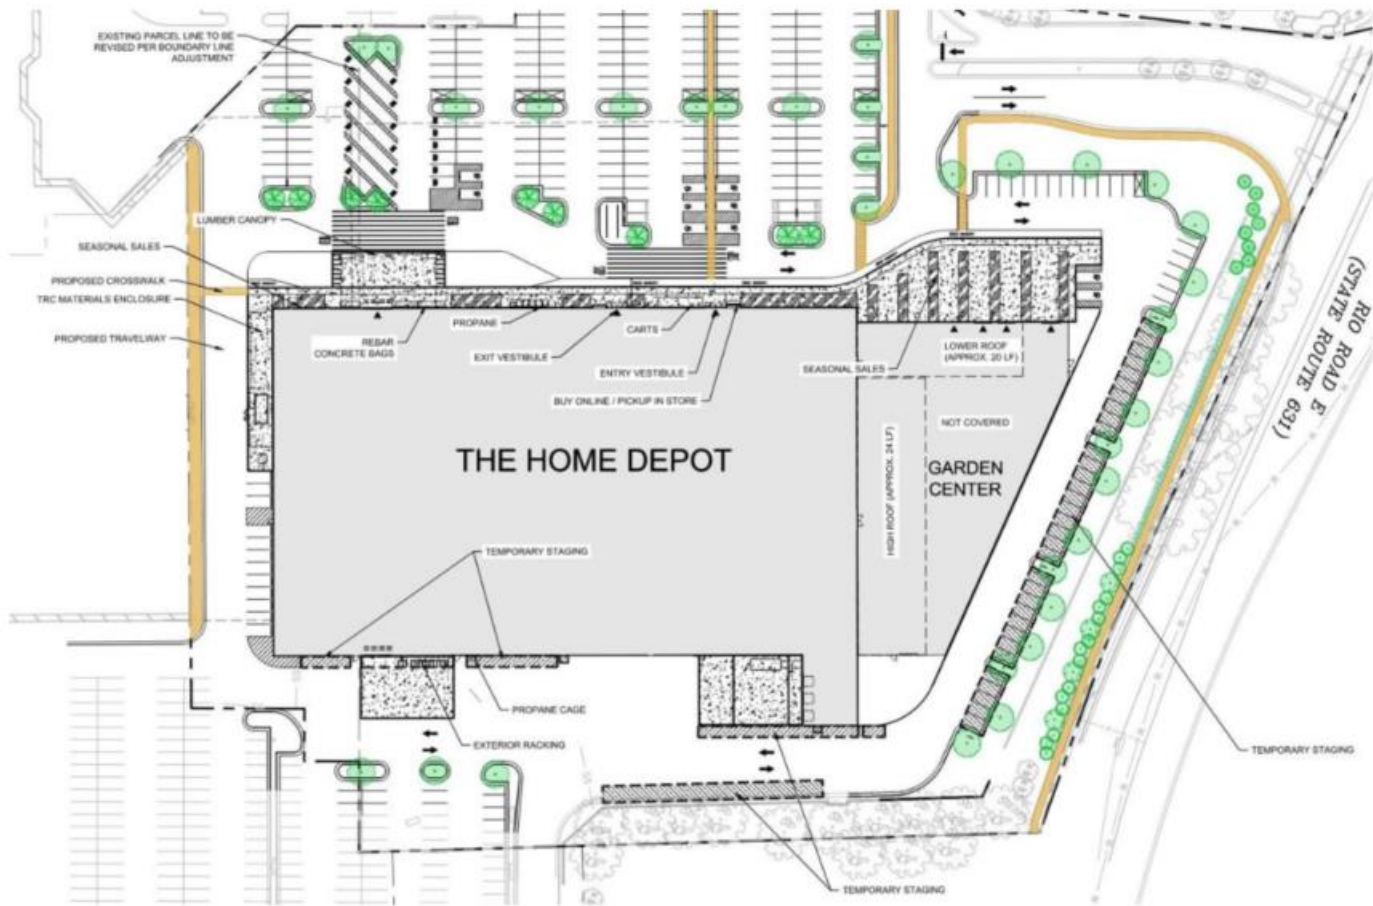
Concept plan revised to show the future travelway and new northern end of the mall, changes to be reviewed under the Final Site Development Plan.
